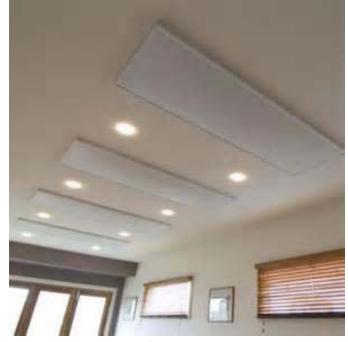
22-2 Picture of ceiling mounted electric radiant heating panels.
